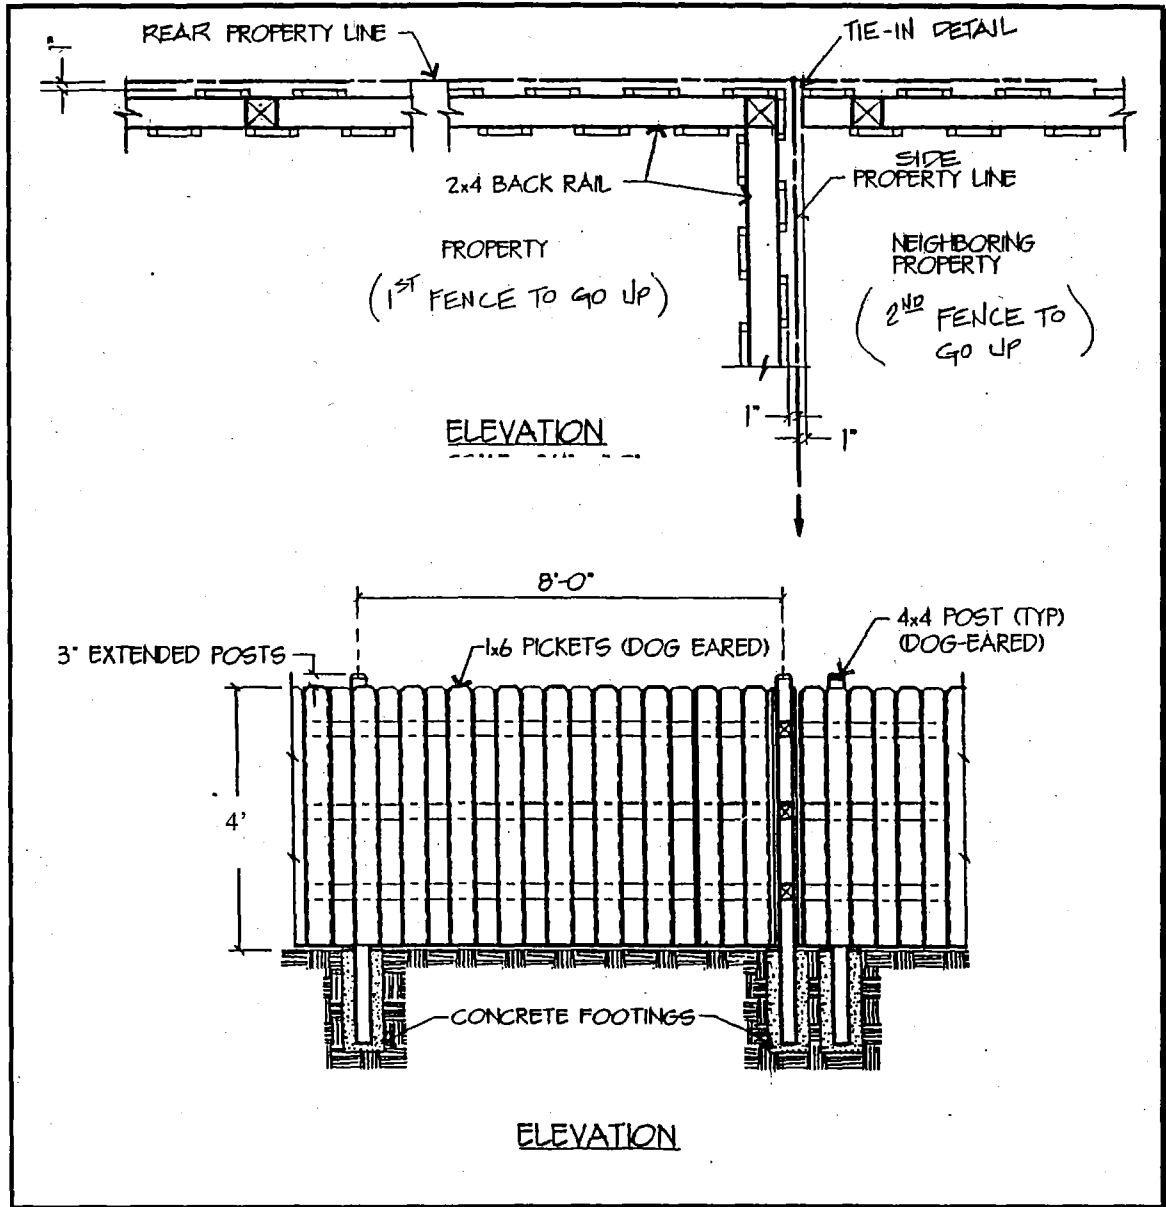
Drawing details for constructing a new fence adjacent to an existent fence.
